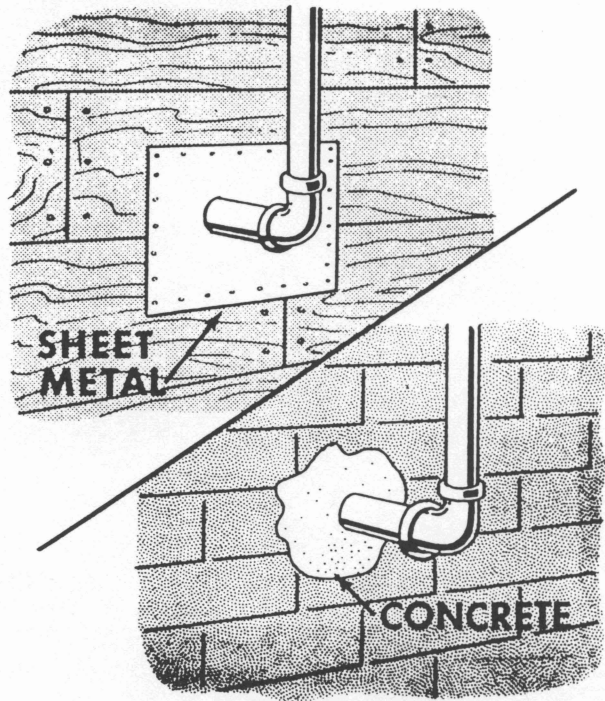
Openings can be sealed with sheet metal, concrete, or similar materials.
